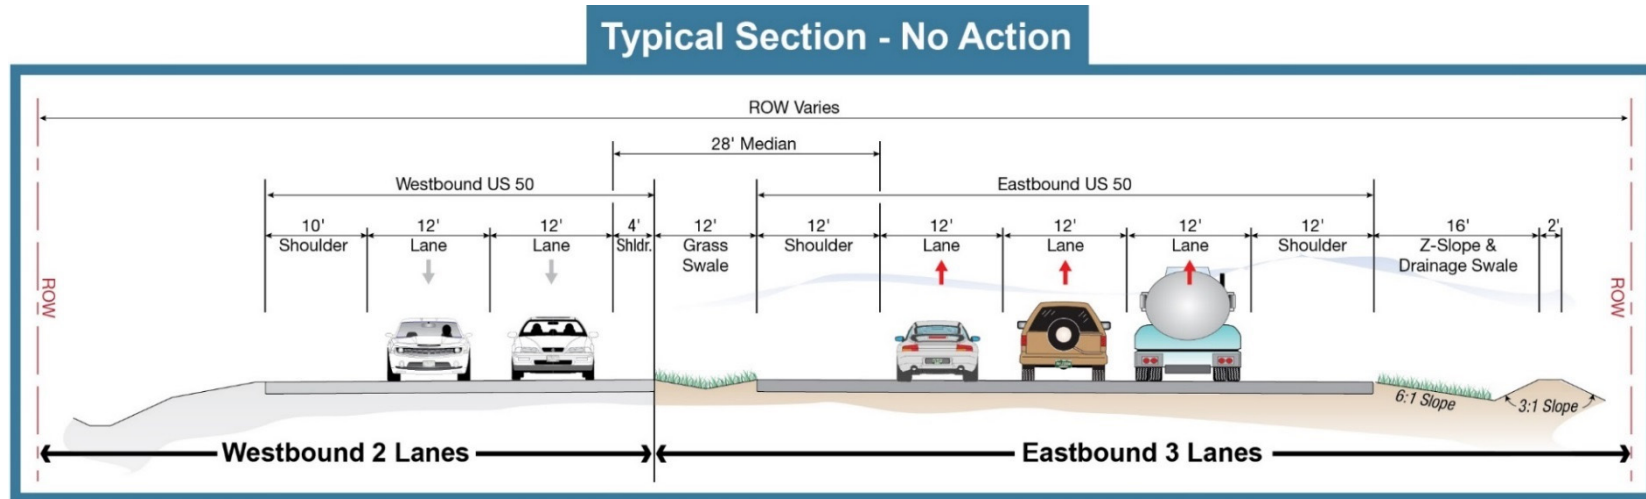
Existing Cross Section Between Swallows Rd and Pueblo Blvd
